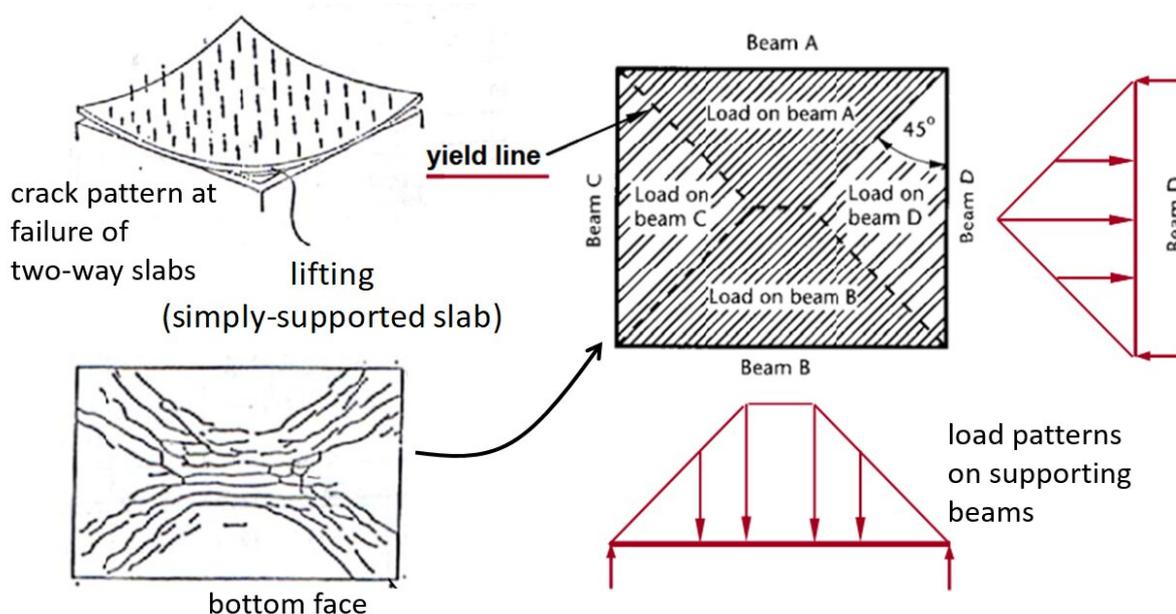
Two-way slabs: crack patterns at failure and load patterns on supporting beams
